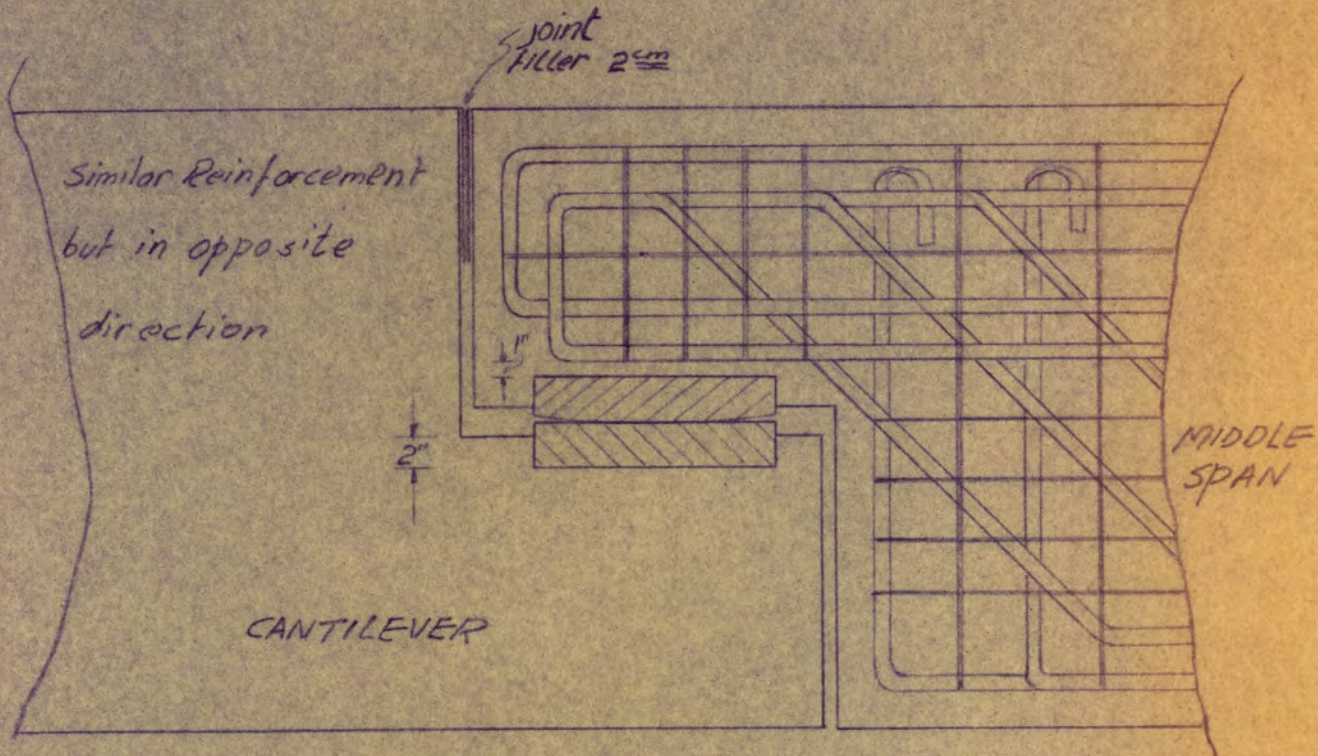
<sup>(a)</sup> SECTION THROUGH BRACKETS OF CANT. AND MIDDLE SPAN
